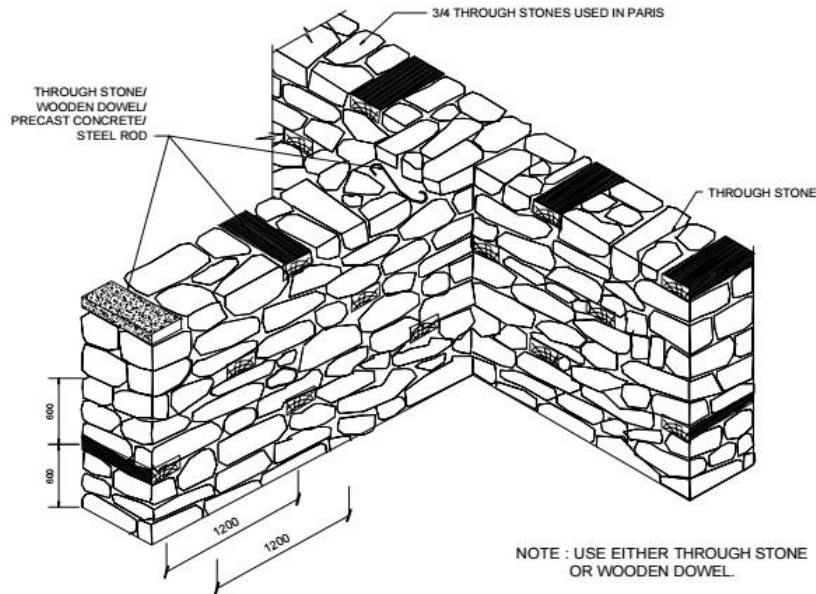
Using of stones and wooden dowels in stone walls. (Adapted from *Guidelines for Earthquake Resistant Buildings, Department of Urban Development and Building Construction, Nepal, 1994*)
